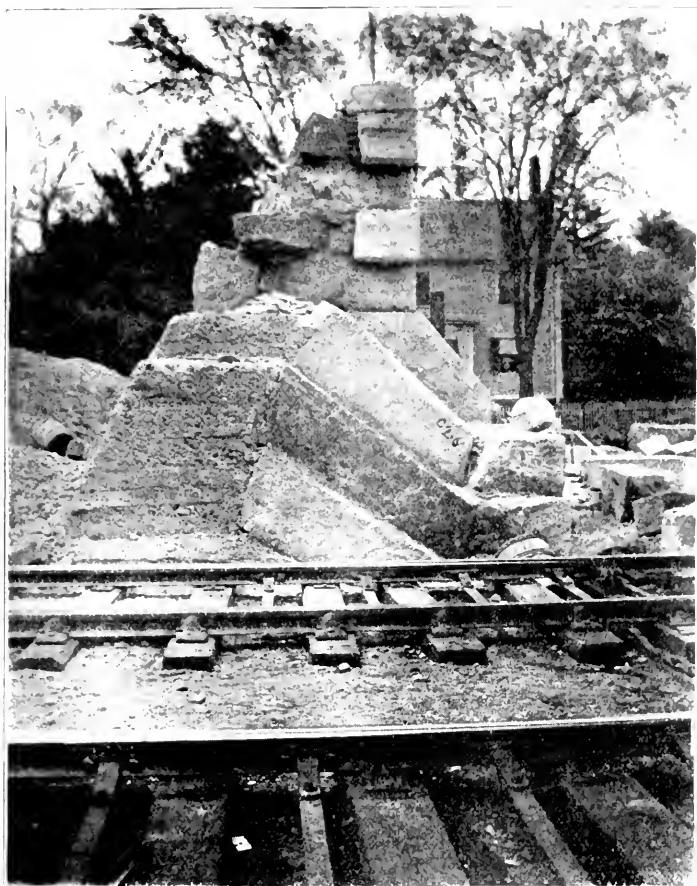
SECTION OF WALK HILL STREET STEEL ARCH ABUTMENT, FOREST HILLS.
